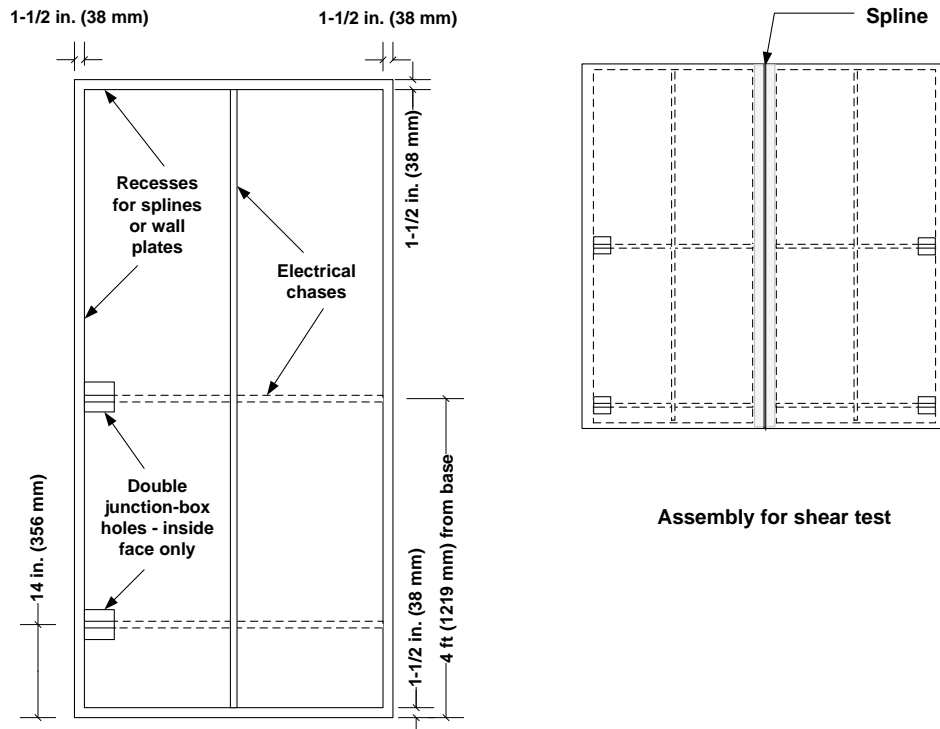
Specimen configuration for racking load tests (1 inch = 25.4 mm)
